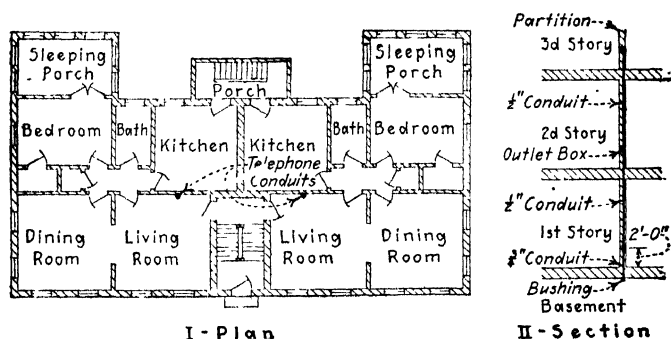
Plan of an apartment building and section showing method of placing conduits for telephone service.
